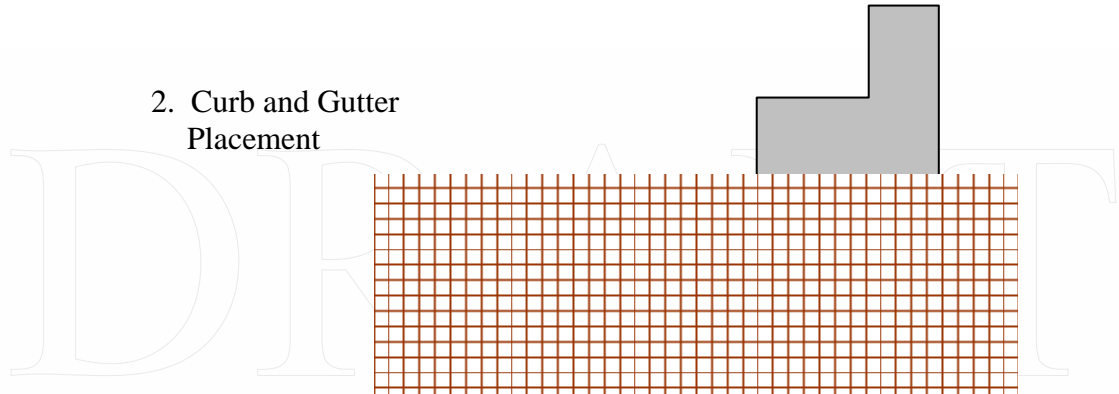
Full-Depth Hot Mix Asphalt Pavement Construction Sequence
